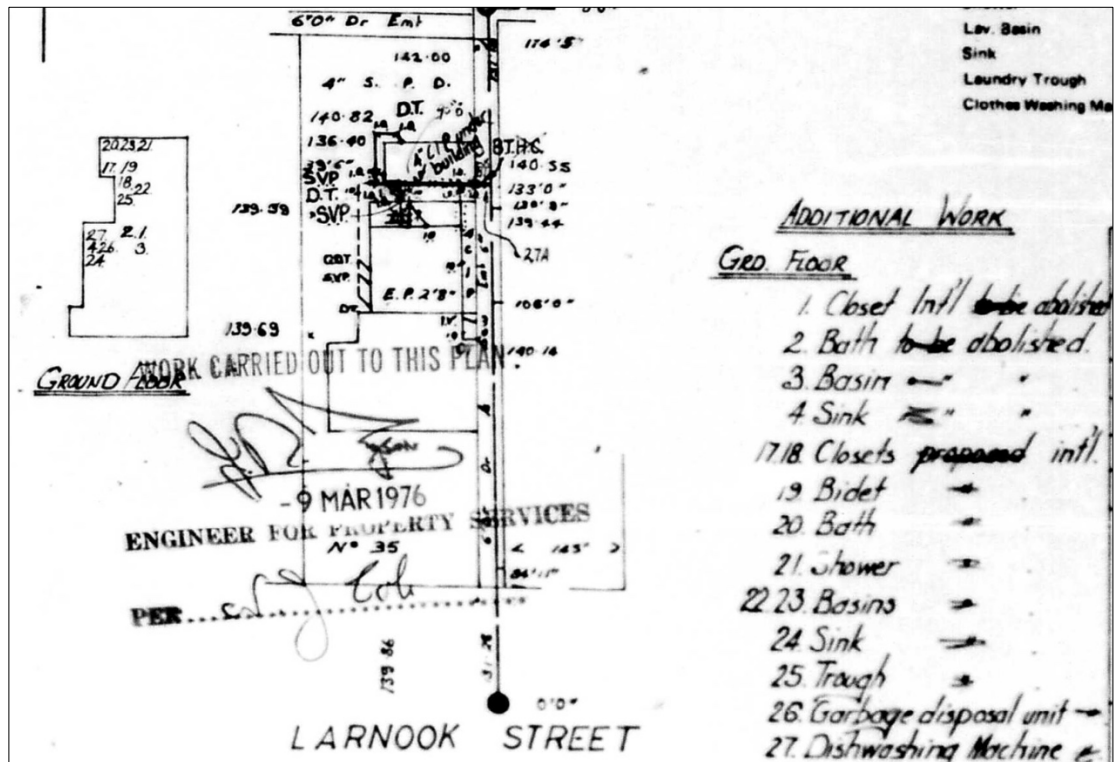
An MMBW Property Sewerage Plan for 35 Larnook Street, dated October 1958. Source: South East Water.
